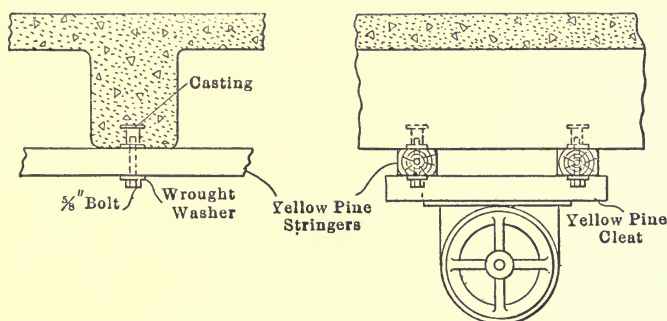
WOODEN STRINGERS SUPPORTED FROM SPOOL CASTING.
